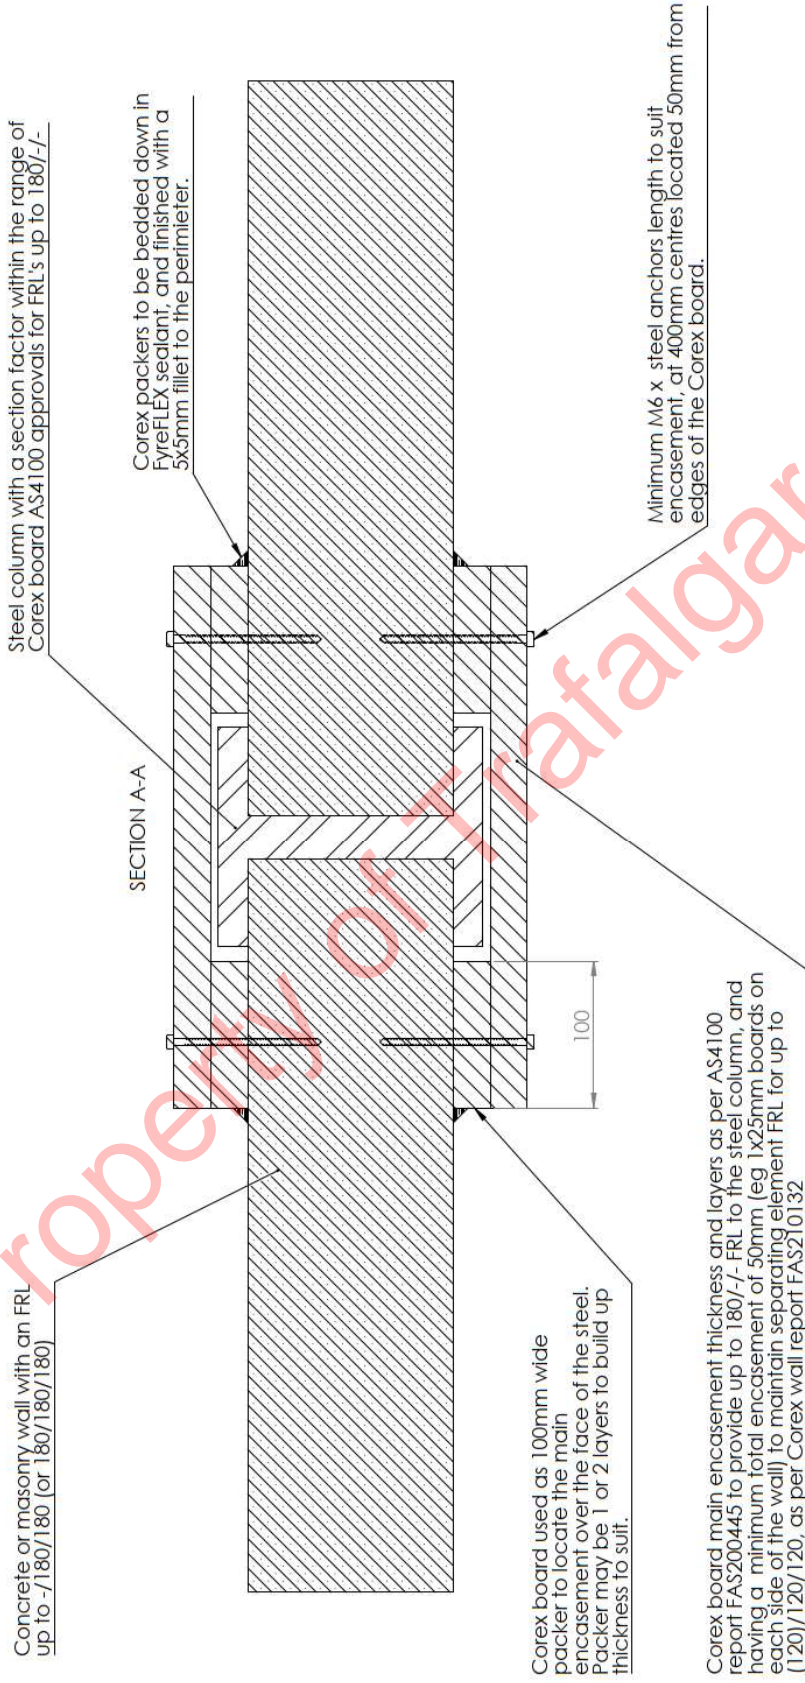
The construction detail of block wall and steel interface protected with A1 COREX board – section view 1
